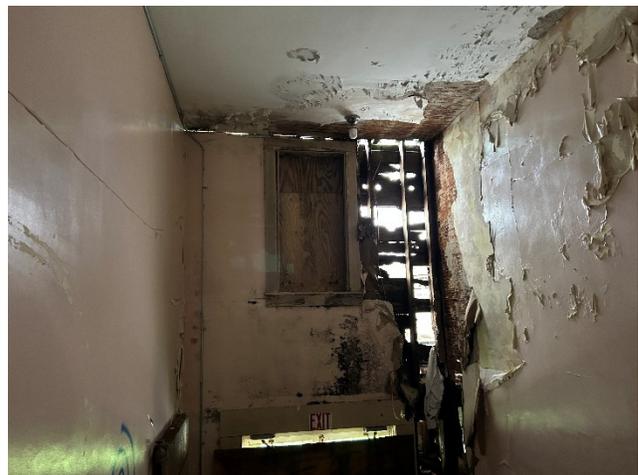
Daylight was visible from the interior via missing and deteriorated wall substrate.
